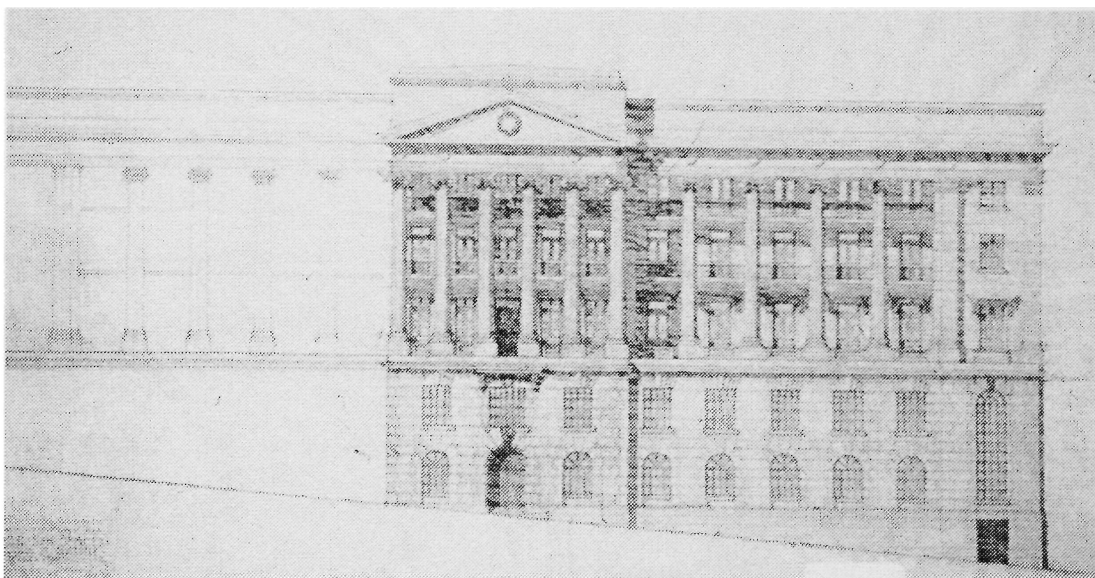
river elevation proposed new executive building William Street 1936 (QSA PD93.5/3)
